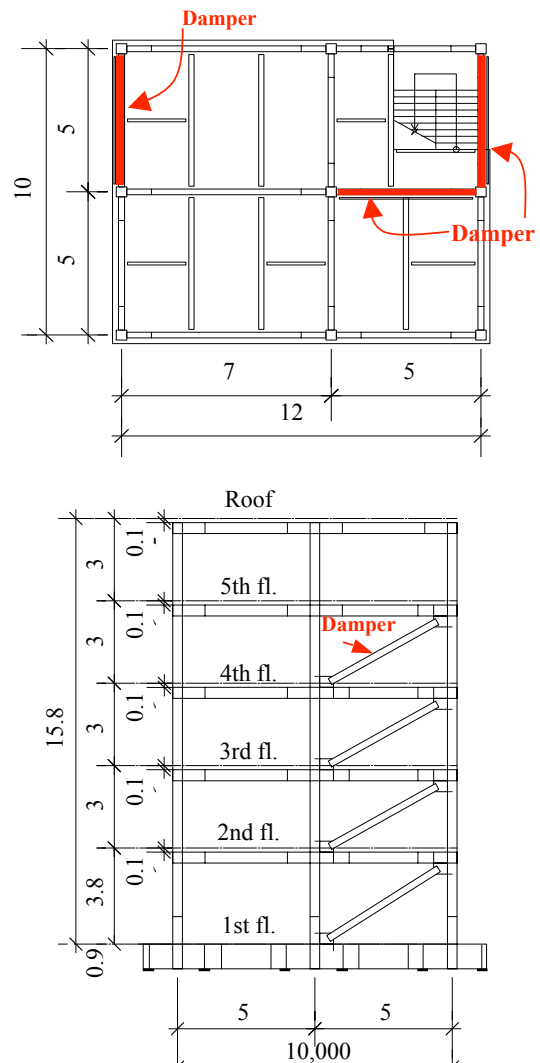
Full-scale 5-story steel building with 12 dampers (Unit = mm); Non-structural elements such as cladding panels, windows, partitions, doors, and ceiling will be attached. The nominal floor area for this specimen is twice that of the 4-story steel frame tested to collapse during 2007.
